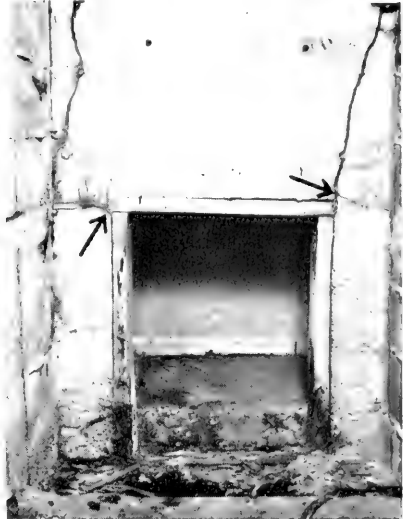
Termite tubes extending out over concrete from the wooden frame of a basement window, the lower part of which is close to the ground.
